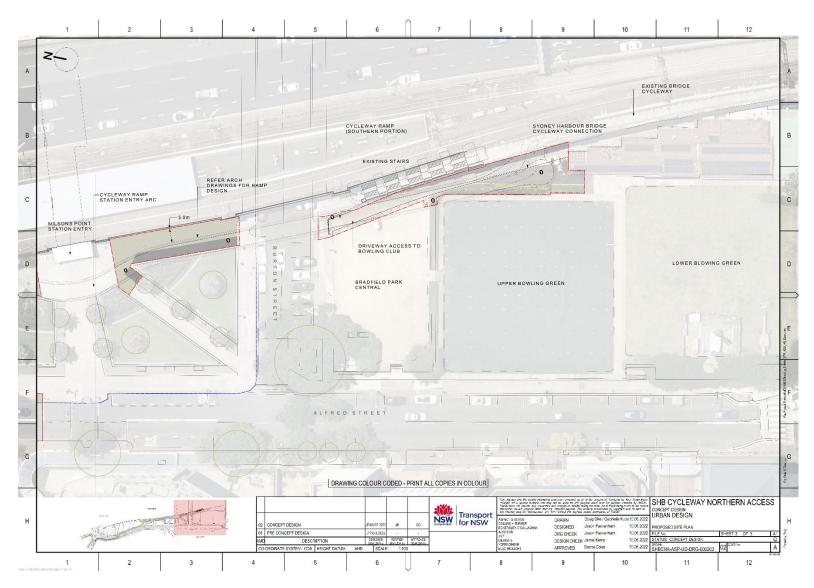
General Arrangement Plan: cycleway arrangement and connection to the bridge (Source: Urban Design drawings, Aspect, 2022)
